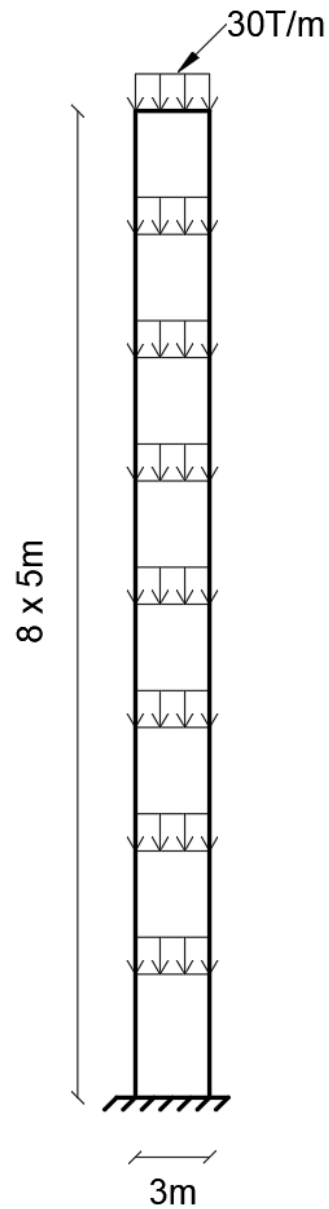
Geometry and loading on the 2D RC shear wall.
